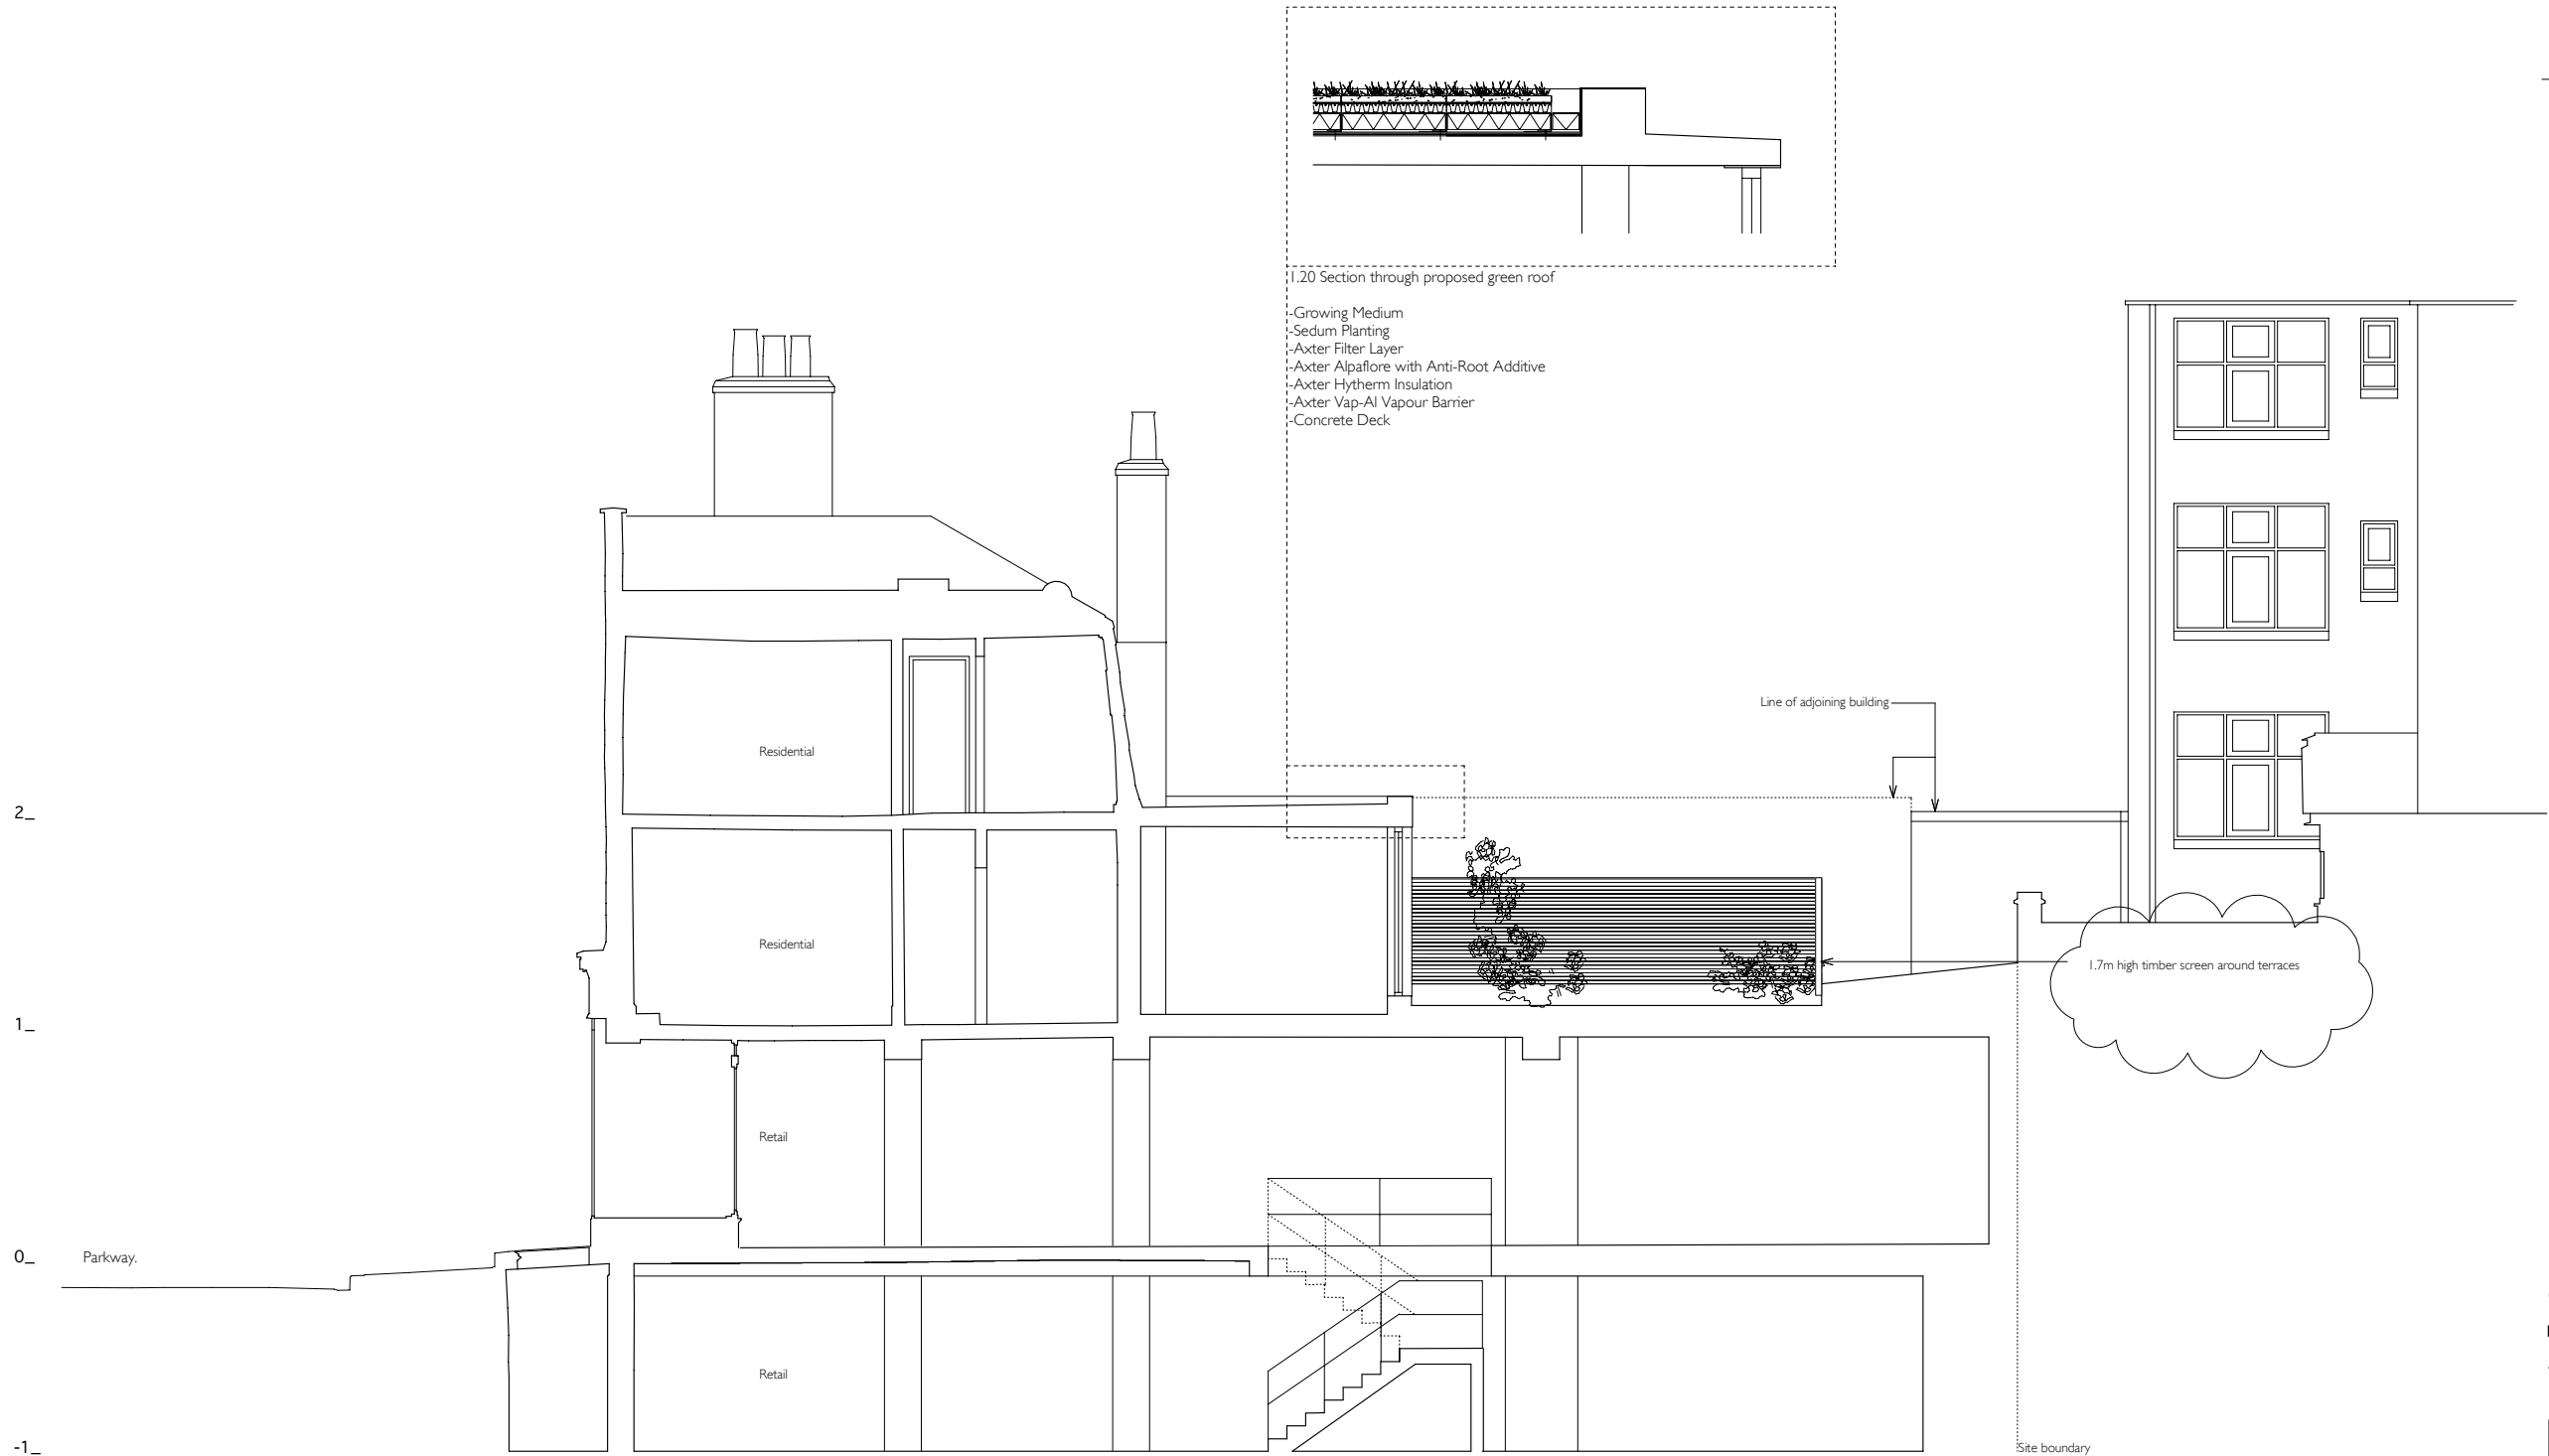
DETAILS REGARDING CONDITION 3 - GREEN ROOF
